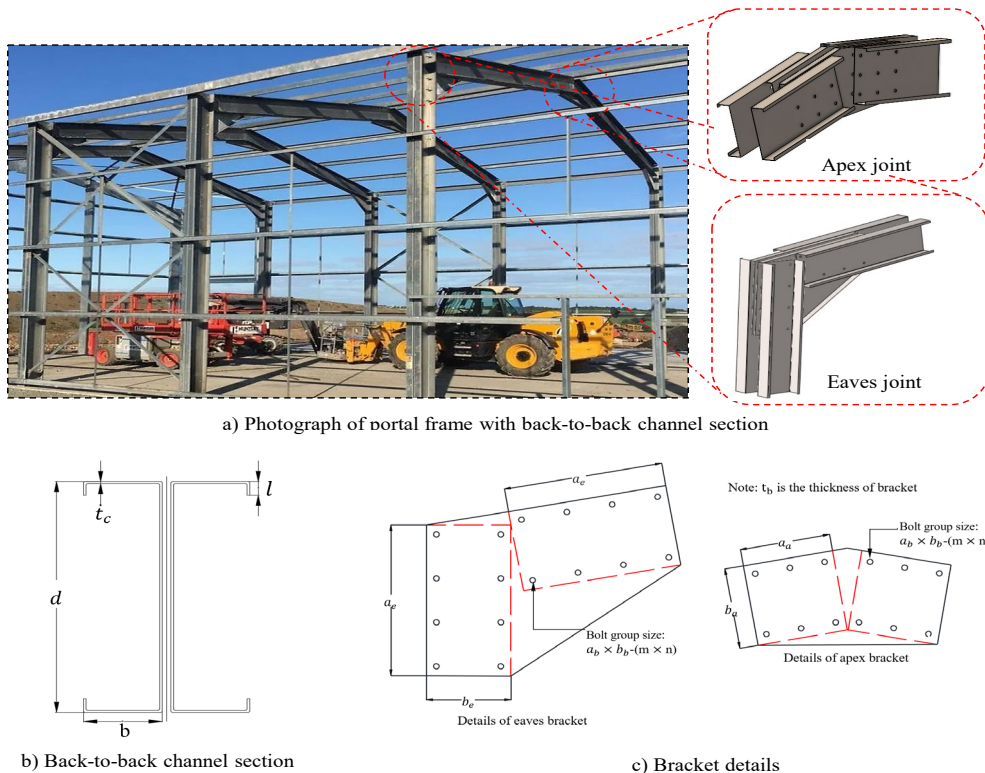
Photograph of a CFS portal frame building with back-to-back channel section and its joints
